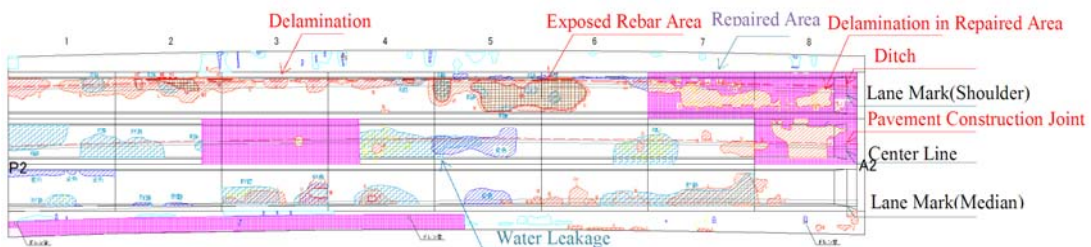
Slab Surface of Bridge E (Lower slab surface)
